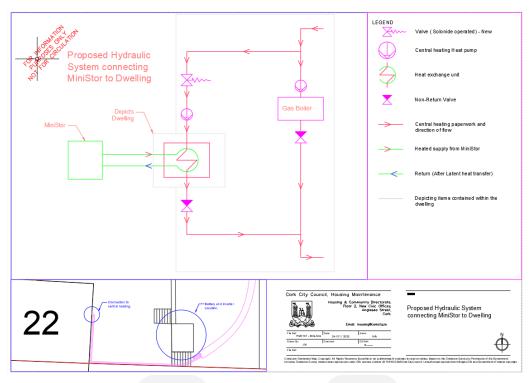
A draft of the proposed connection where stored heat will transfer between the MiniStor Unit and dwelling (Cork demo site).
